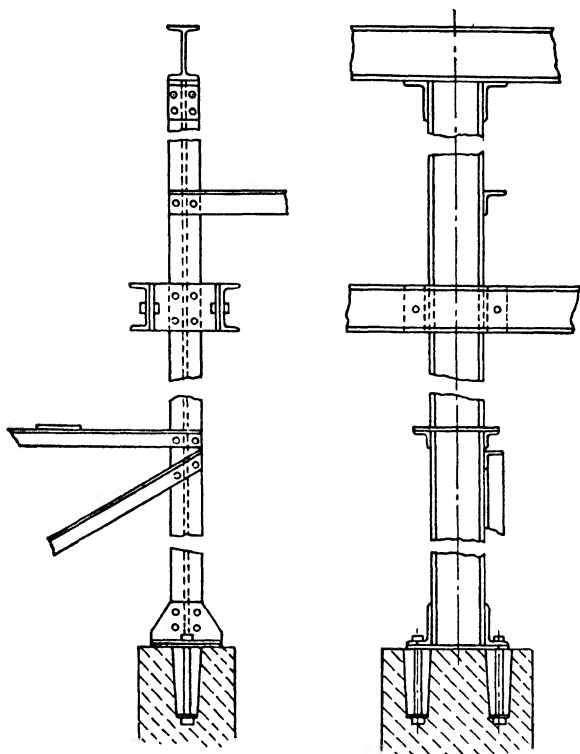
TYPICAL JOINT CONSTRUCTION USED ON GIRDER
